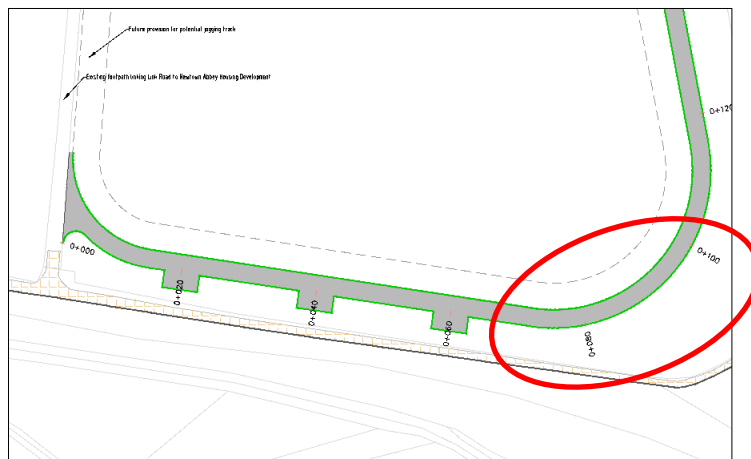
Pedestrian Desire Line with existing stone wall (Dwg No. 11587-2420-D02)
